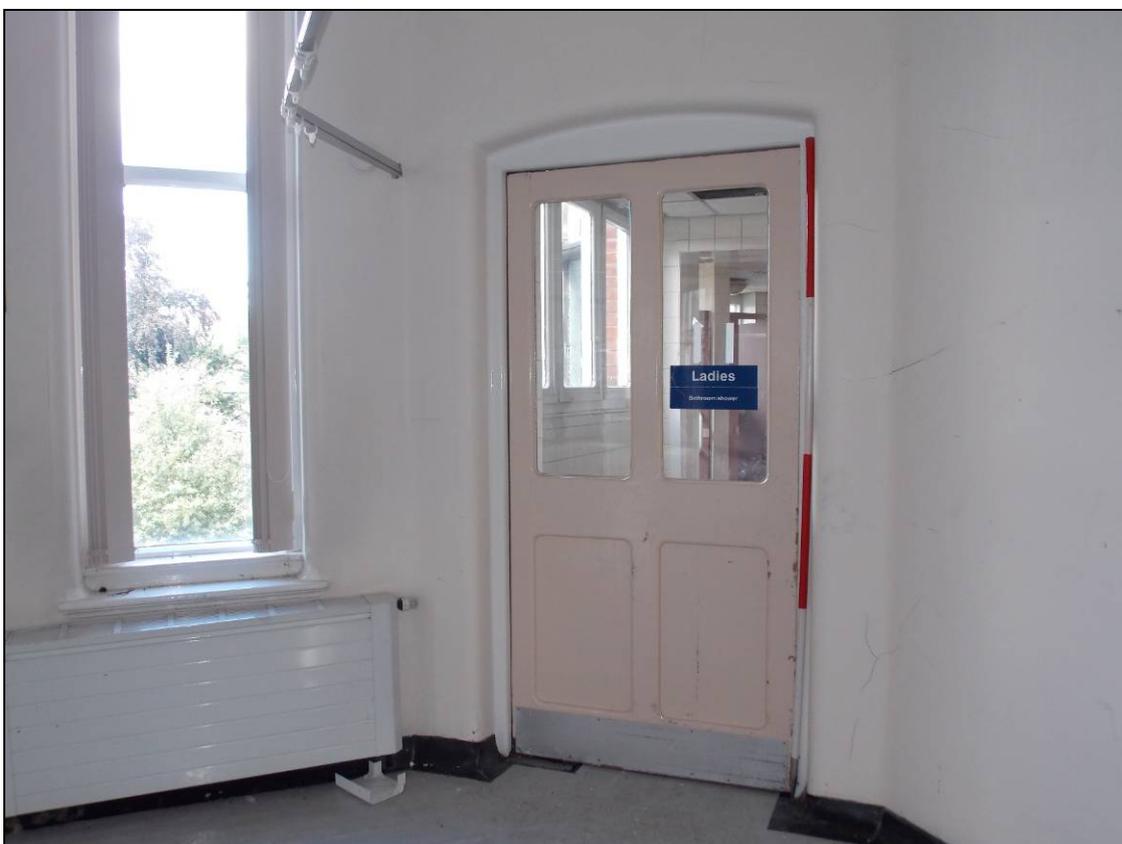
Original door to the Ladies lavatory, looking north-west (scale 2m).
